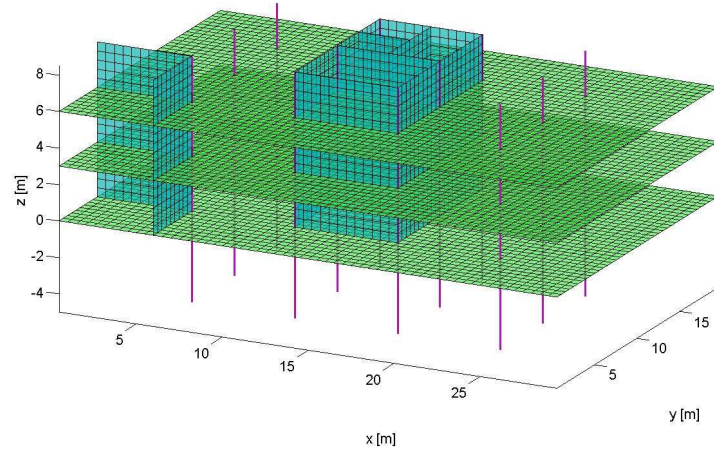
Finite element mesh of the portal frame office building. The external walls and the box foundation is not displayed in the figure.
